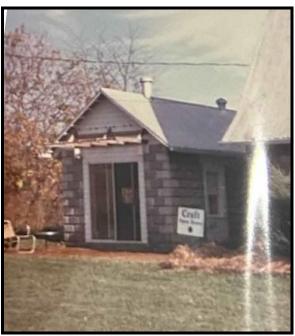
The applicant provided this undated photo of the Milk House. Note the sliding door and what appears to be a wood sash window on the right-side elevation.
